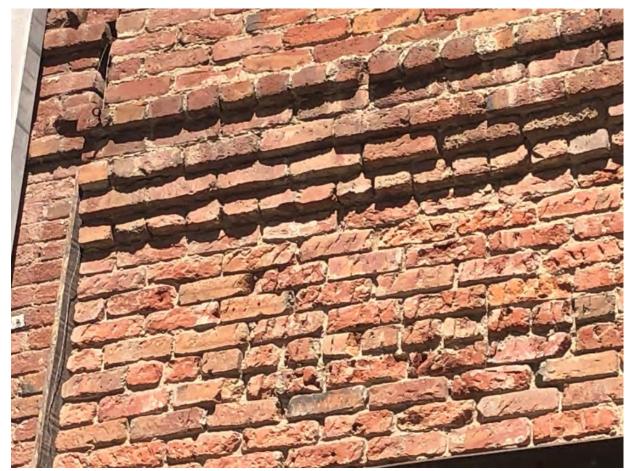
Figure II: Simple brick cornice above storefronts at primary (Pacific Avenue) façade, looking north. 2020.
